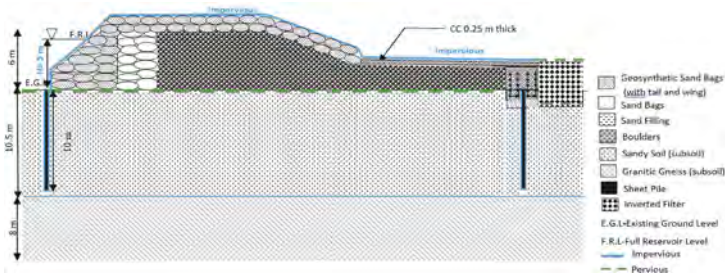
Cross-section of the temporary boulder wall with sheet piles and geosynthetic sandbags.
